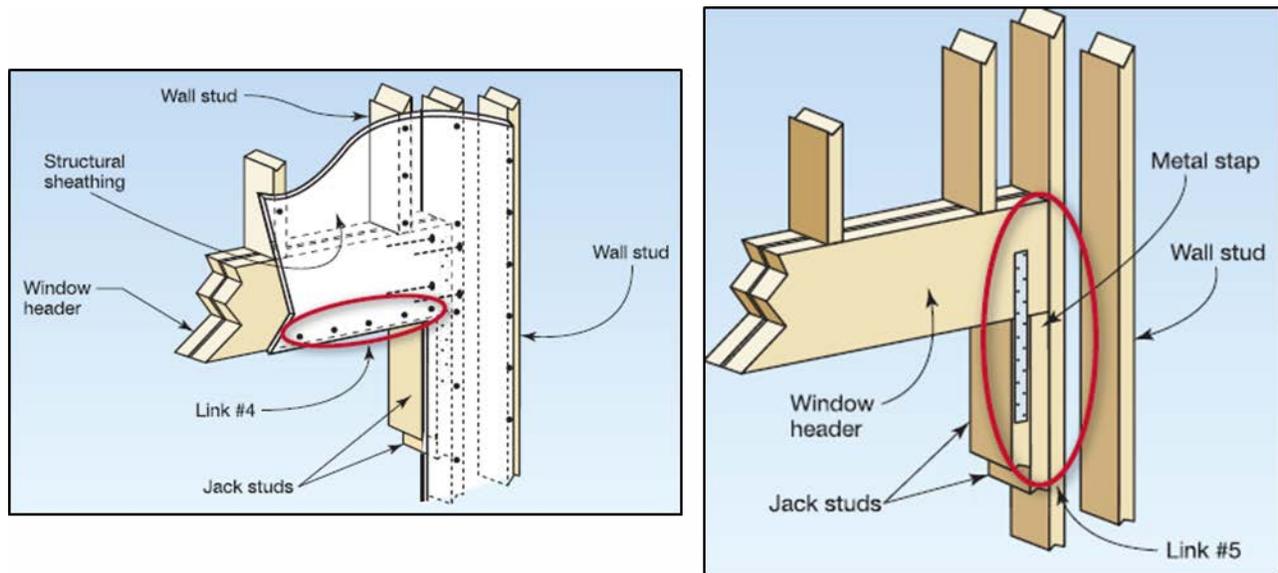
Connection of wall sheathing to window header (left) and window header to exterior wall (right) as part of a wall framing system.
